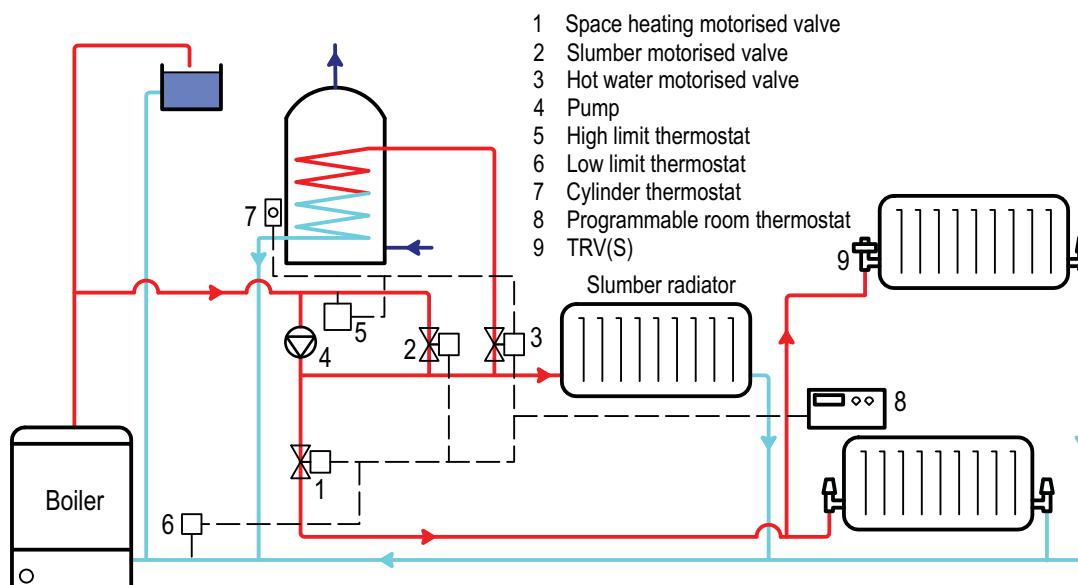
Example of a possible schematic arrangement for solid fuel boiler with fully pumped circulation and one heating zone
